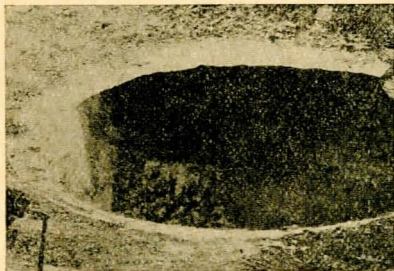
A pit silo in the making. The heavy concrete collar is shown exposed, and a part of the wall has been covered with the first coat of plaster.
